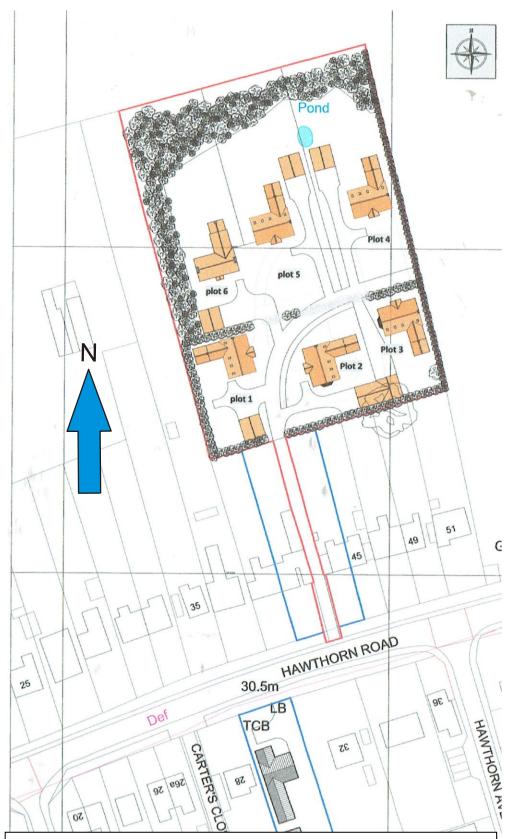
Block plan showing the proposed layout of the development site at an original scale of 1:500, (not to scale), (extract from Architects plan)
